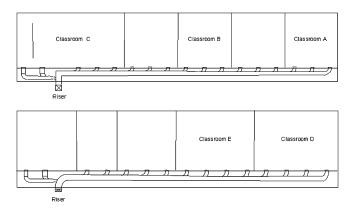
Plan layout drawings of the classrooms and HVAC systems of the second (top) and fourth (bottom) floors of the study building, before renovation of classrooms A and C.
